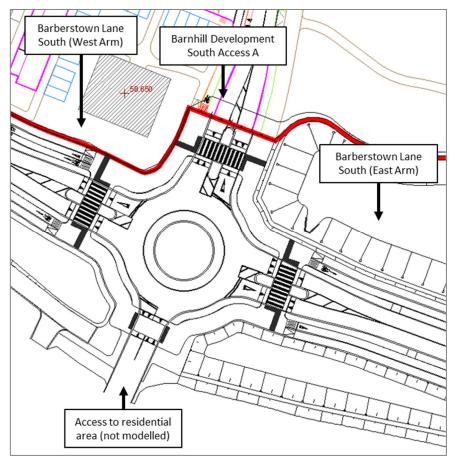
Proposed Barberstown Lane South/Barnhill Development Access A Junction Layout
